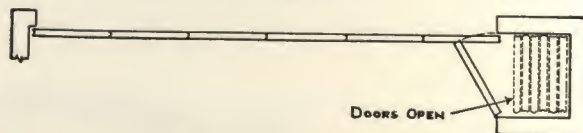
See how the doors disappear into a Wall Pocket. Swing door can be completely shut when the Partition Doors are fully opened or closed.
